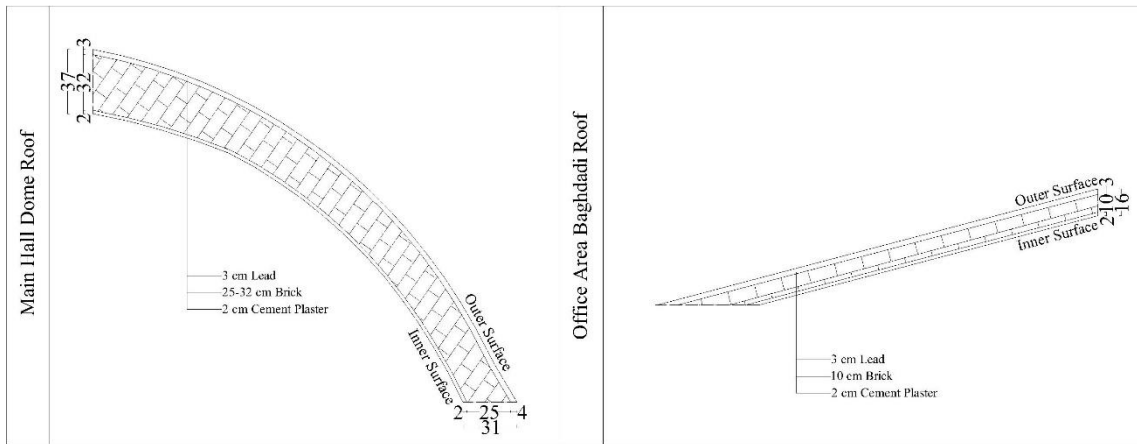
Sections of main hall's dome roof and office area's baghdadi ceiling
